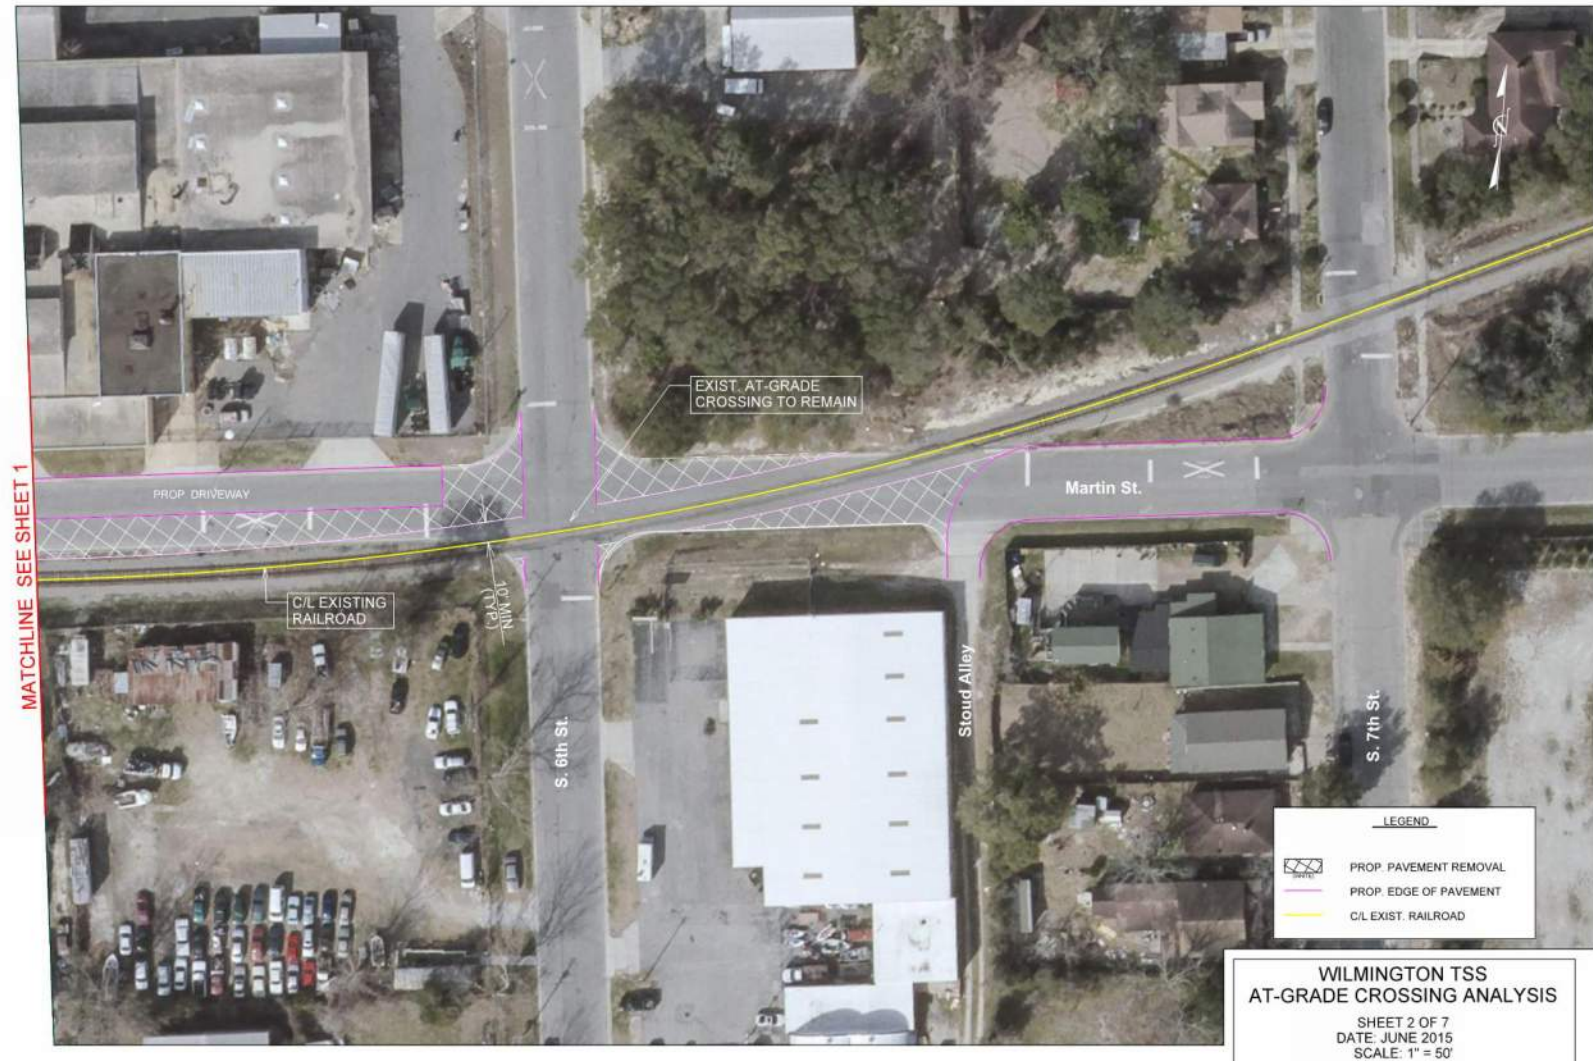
S. 6th Street / S. 7th Street Alternative Recommendations
